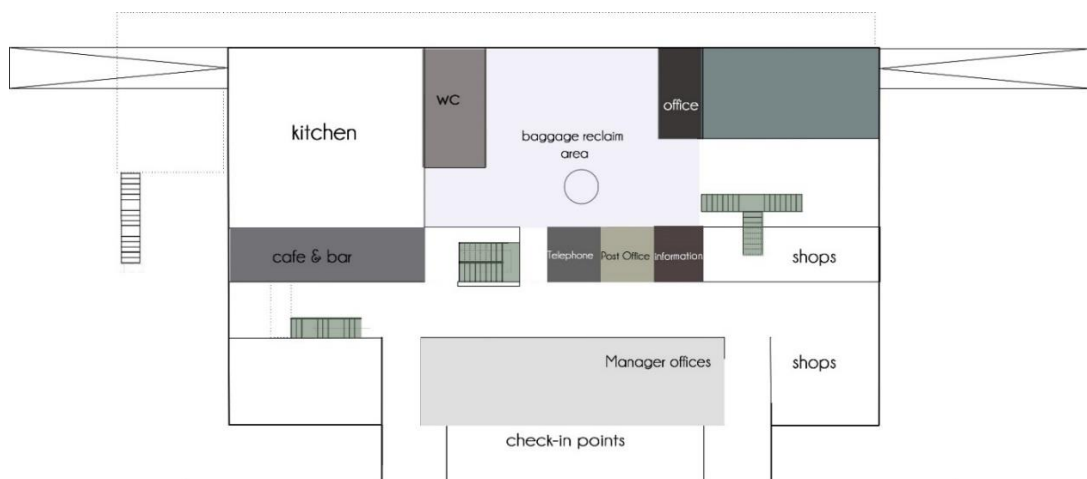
Estimated Ground Floor Plan Zoning Showing the Facilities (by Author).
